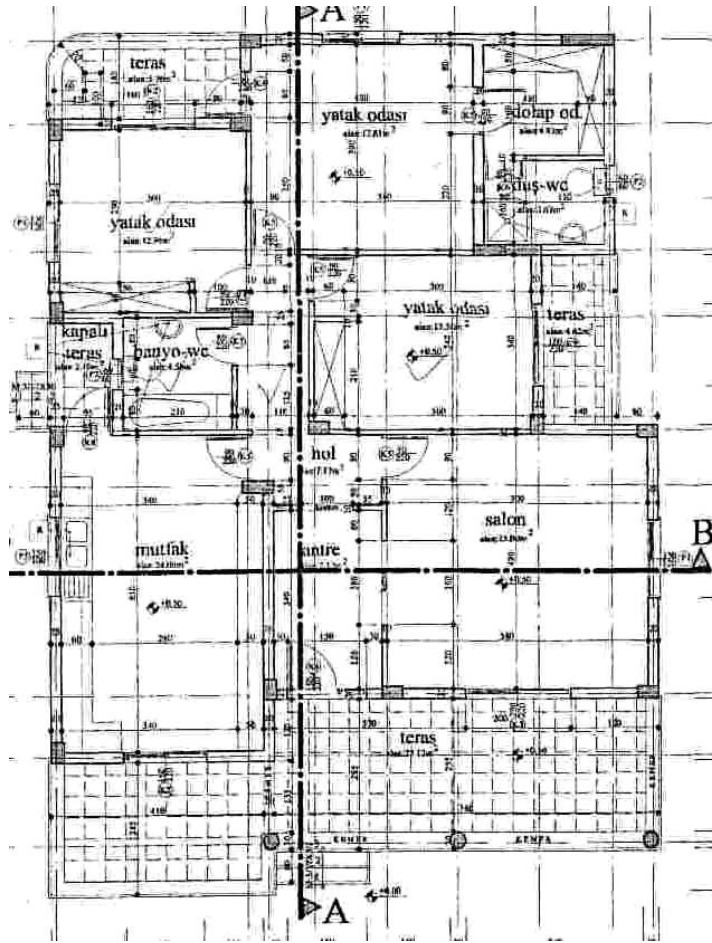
Plan of custom designed single-storey private house for a young couple in Tuzla village (2006).
